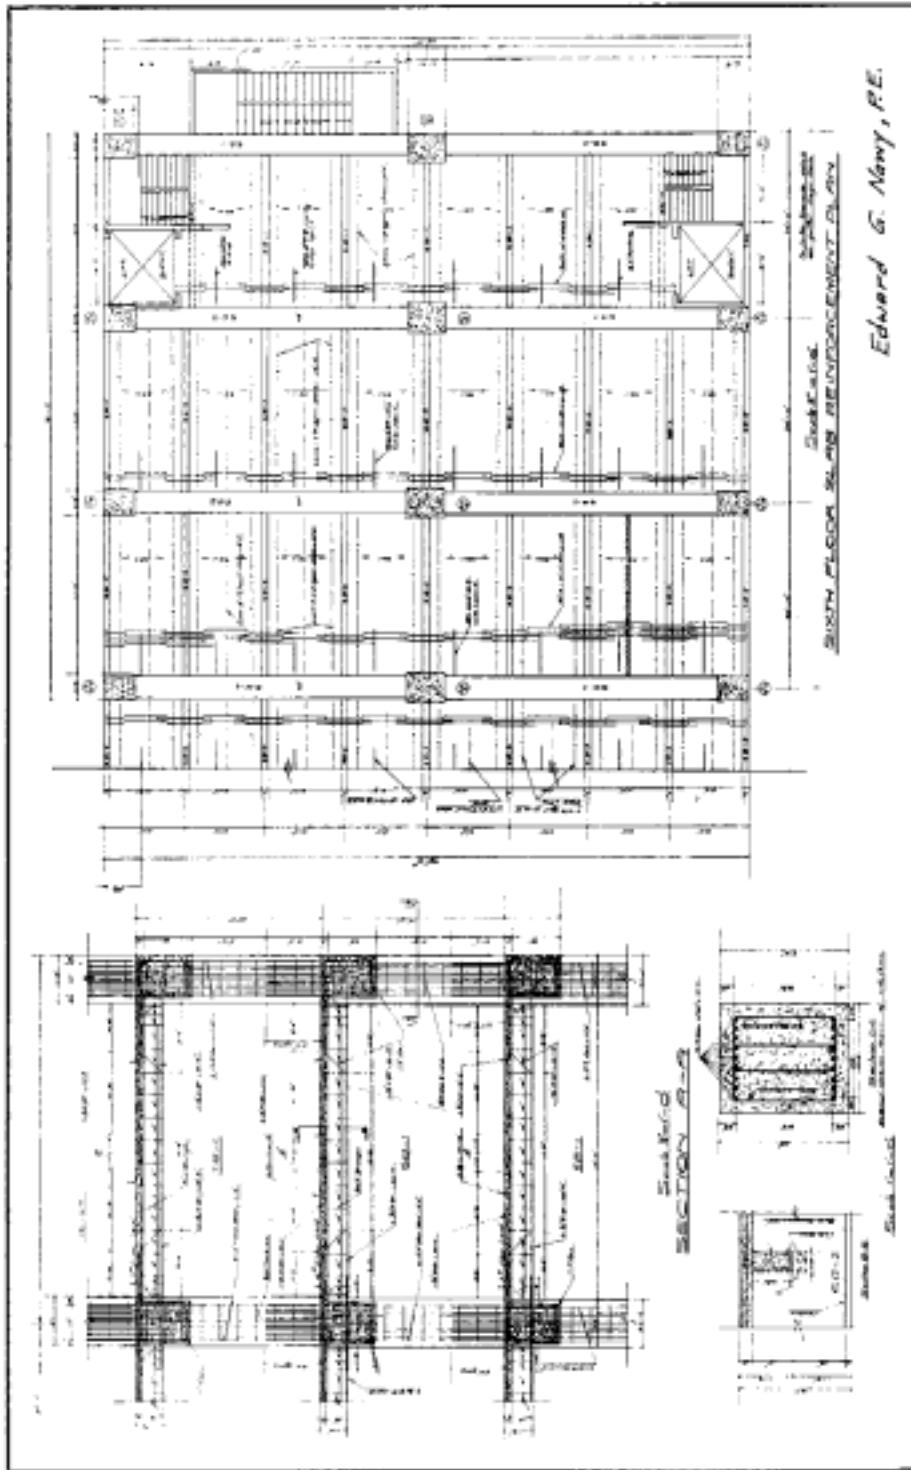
Typical beam and slab reinforcing working drawing. (Design by E. G. Nawy.)
